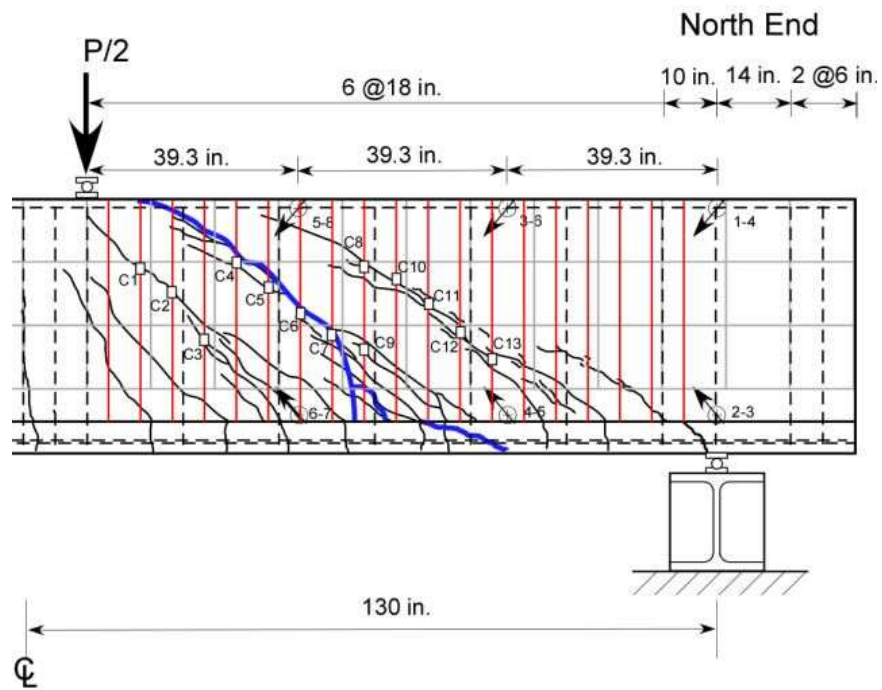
Specimen IT.7.18.6.S crack map (failure test)
